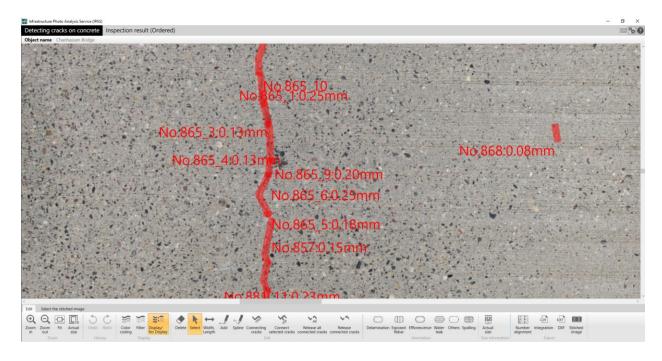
Fuji Film AI Crack Detection on Bridge Deck Close Up
